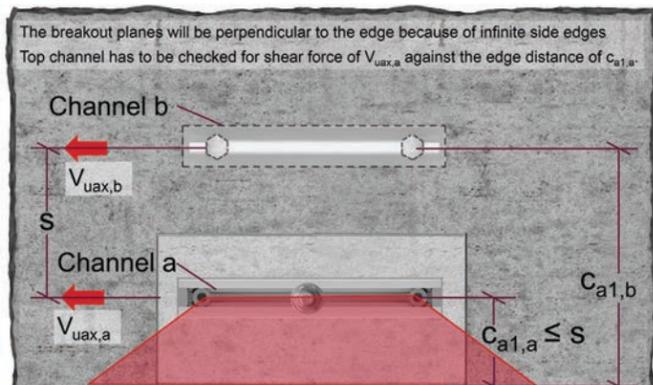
a — Longitudinal Shear — Plan view-Top anchor channel.
